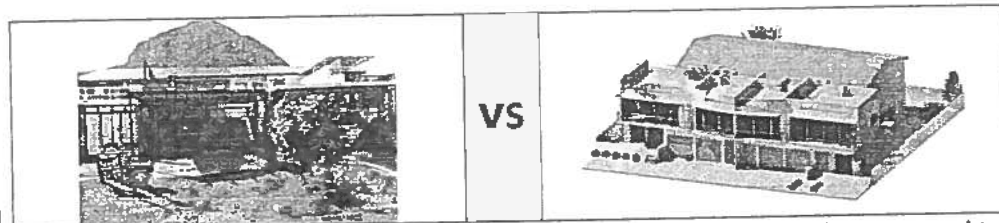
Sketch illustrating the proposed upgraded townhouse complex
